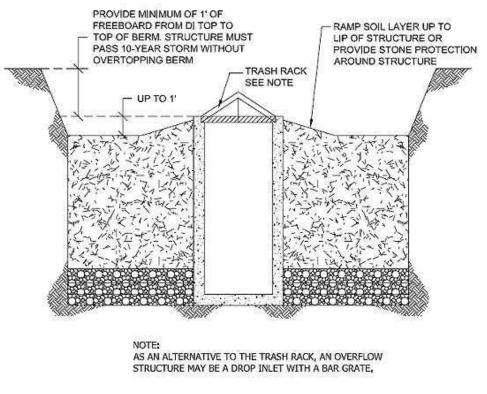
Typical Detail of how to prevent bypass or short-circuiting around the overflow structure
